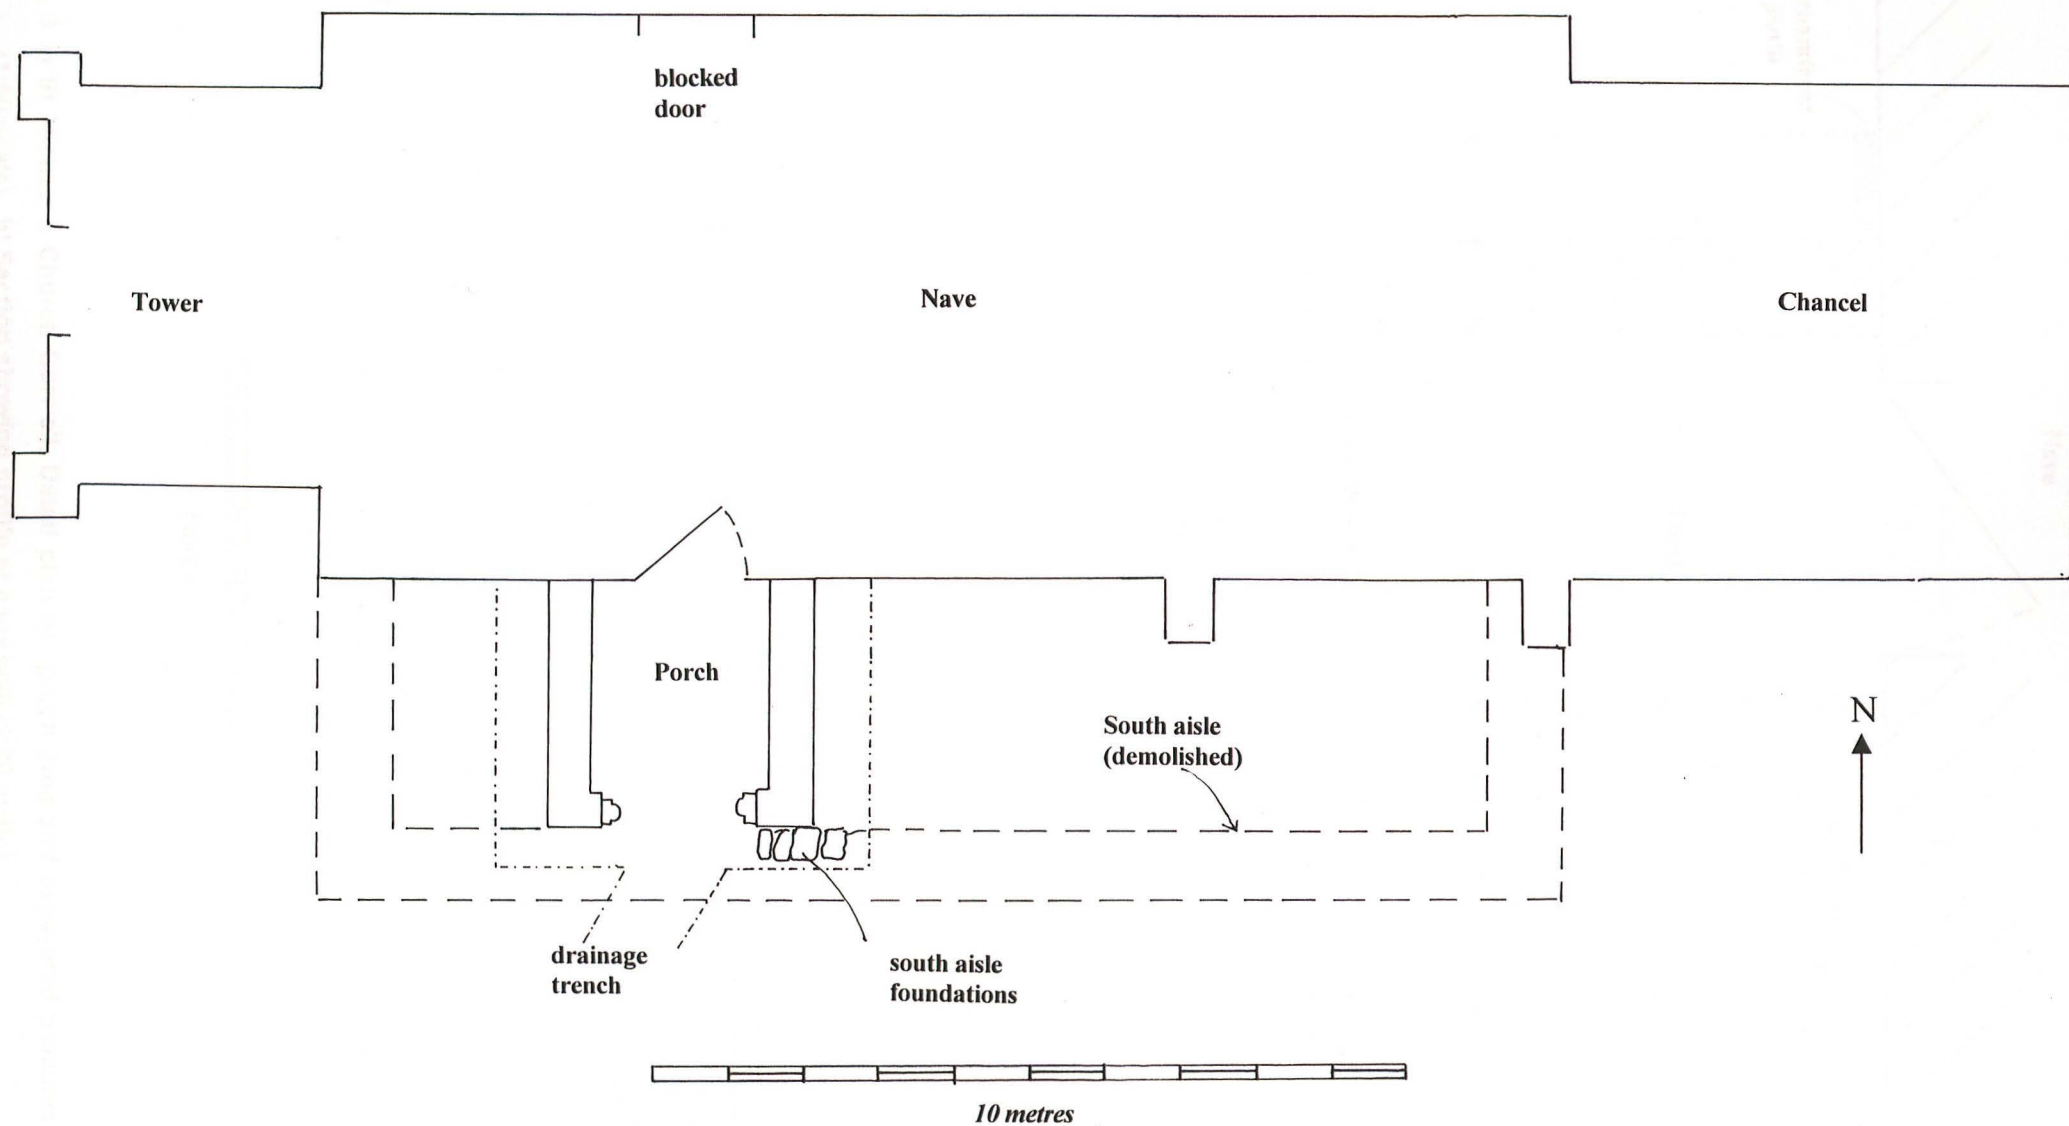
St Michael's Church Burwell. Sketch plan of church showing location of the monitored trenches (1:100 scale).
